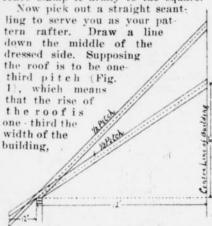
Rafters for half and third pitch, 24-foot building.
